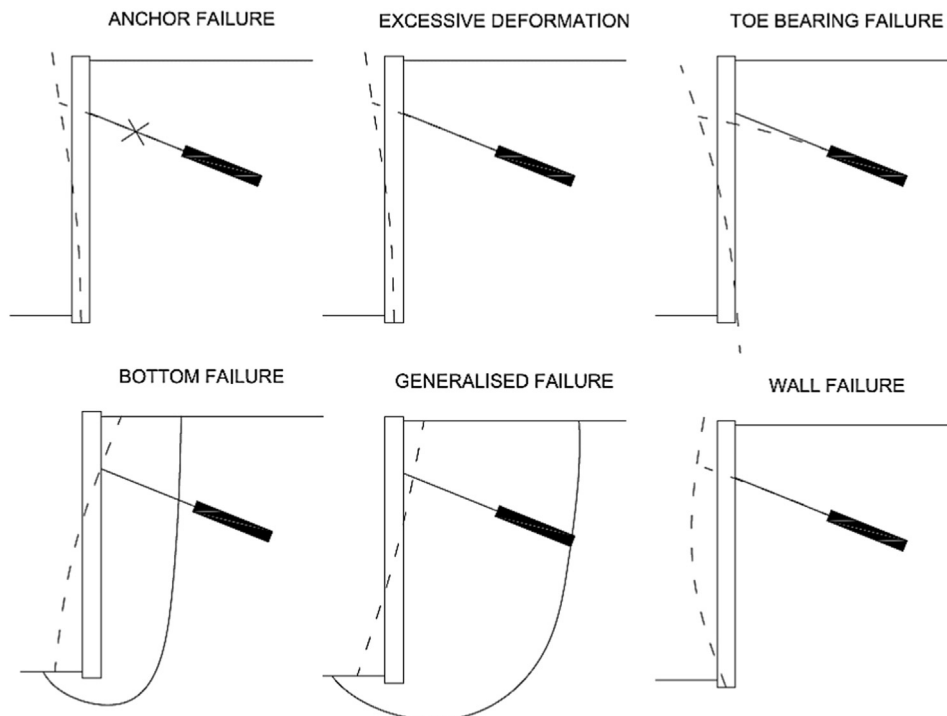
Failure modes of tie-back walls (adapted from [3]).
